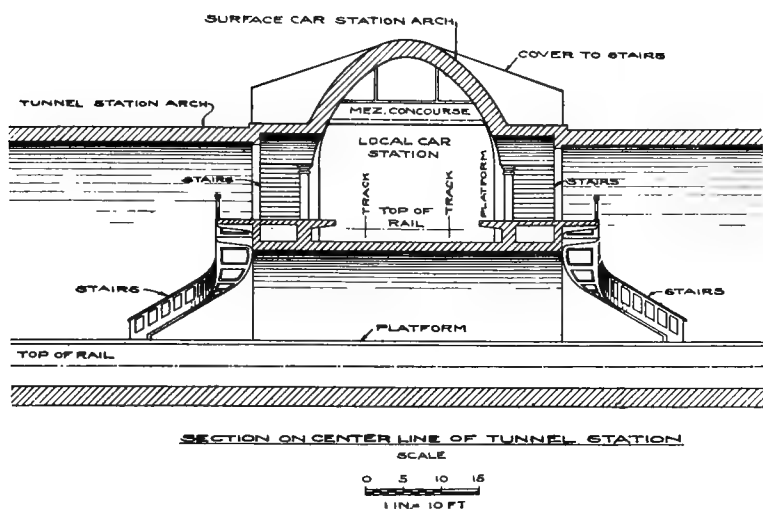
LAGUNA HONDA STATION, SECOND STAGE.
